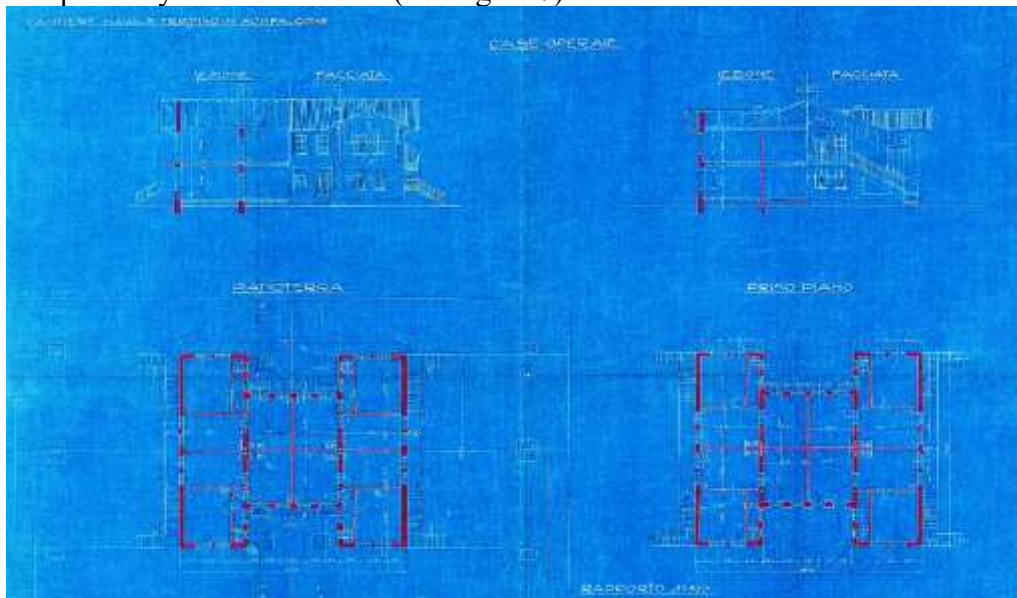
Drawing for the 'H-type' Housing Project, Typology 1A. Crossed Sections, Main and Lateral Fronts, Ground Floor and First Floor
